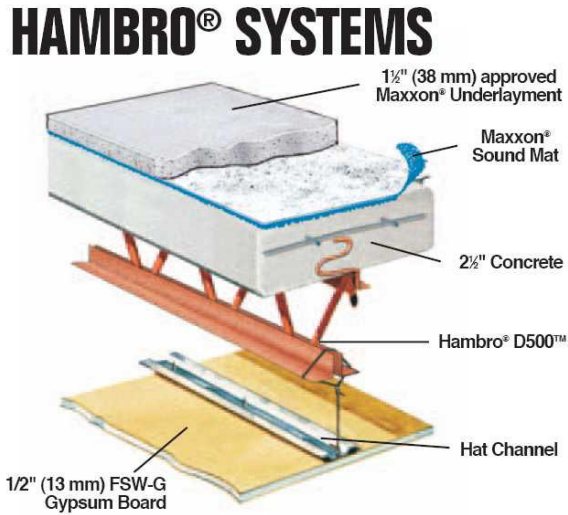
Detail of D500 Floor System courtesy of Hambro®
